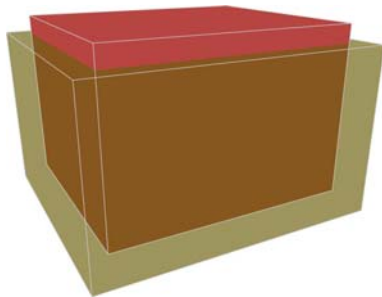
Conservation of authentic facade of the building and change of its interior structure. Source: ill. S. Hanets
